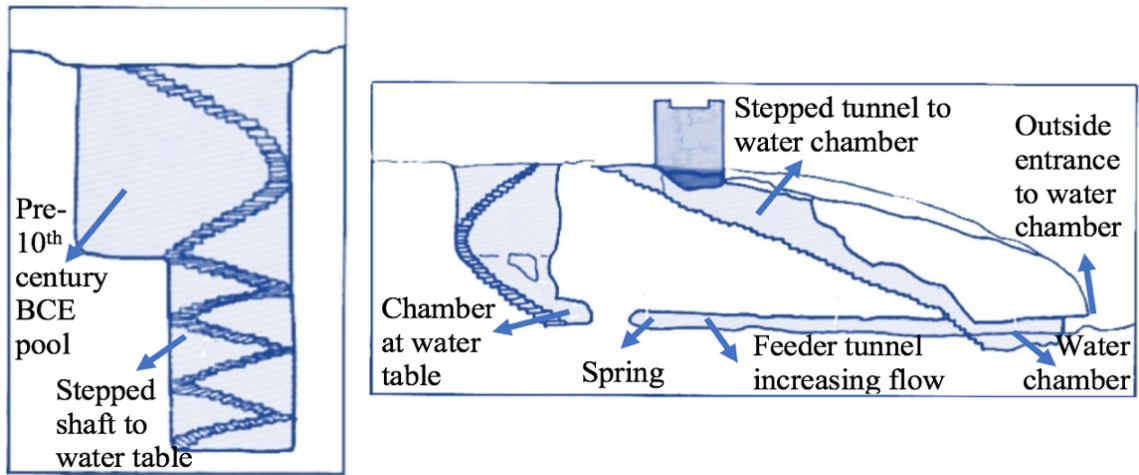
Section of pool and tunnel water system at Gibeon (adapted from Cole 1980)
